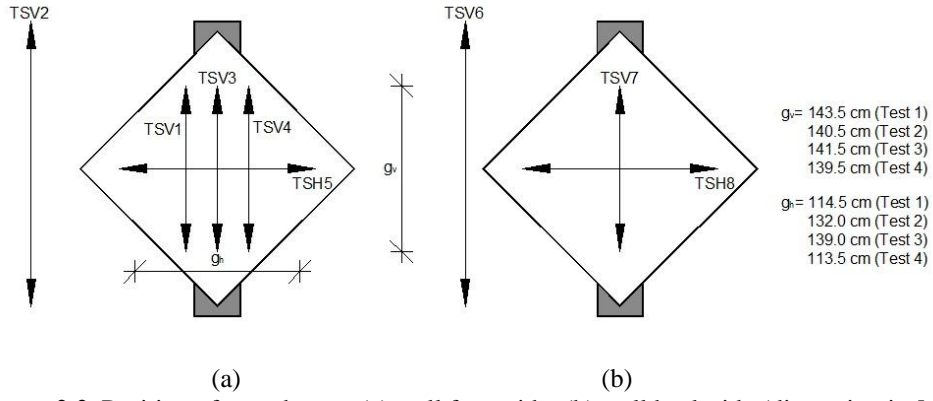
Position of transducers: (a) wall front side; (b) wall back side (dimension in [cm])
